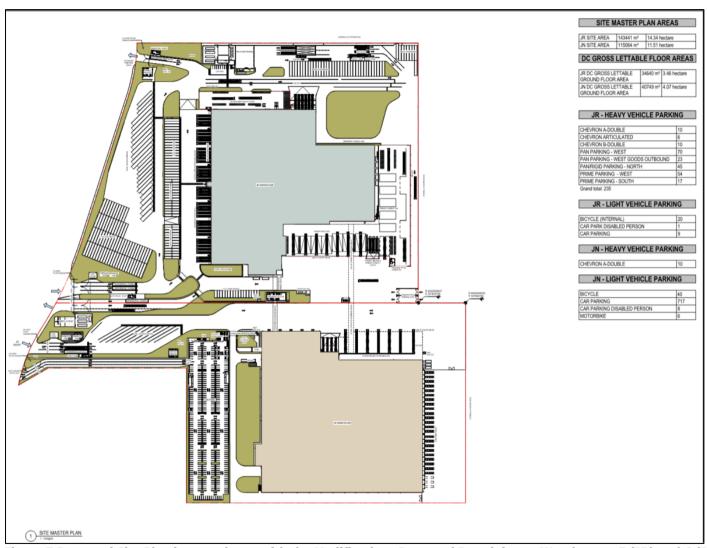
Proposed Site Plan in accordance with the Modifications Proposed Pertaining to Warehouses 5 (JR) and 6 (JN) (Source: Bell Architecture, 2020)
